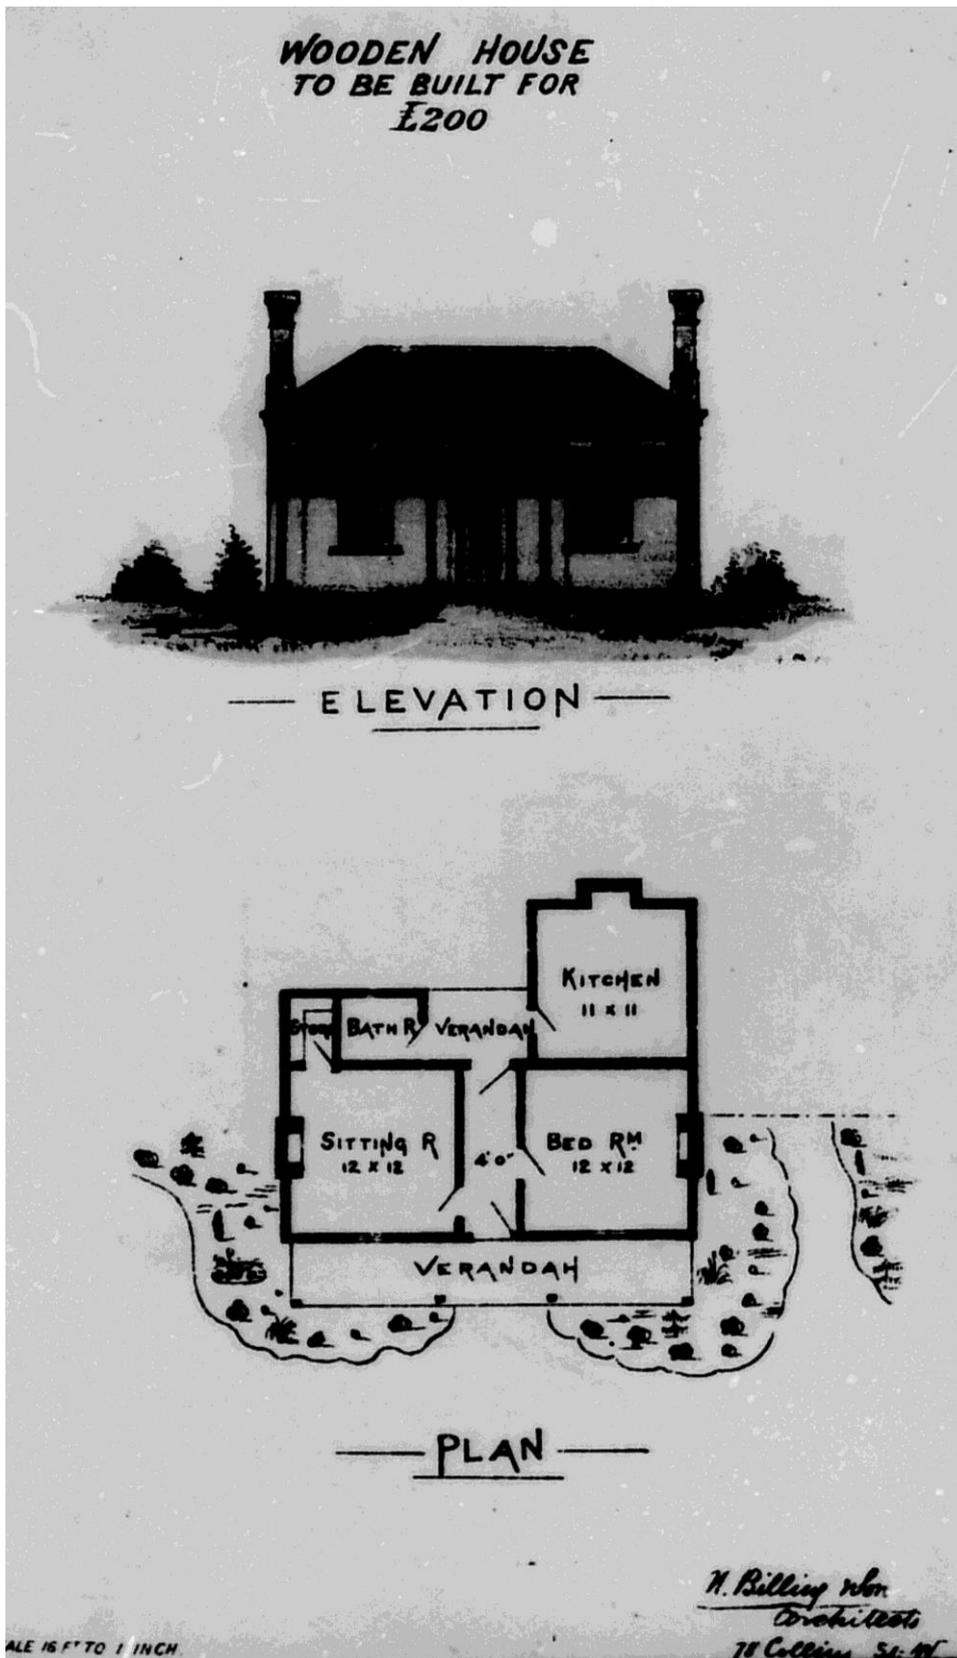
This house costing £200 and containing a bathroom is approximately the same as the plan shown on the MMBW Detail Plan No. 1375.
